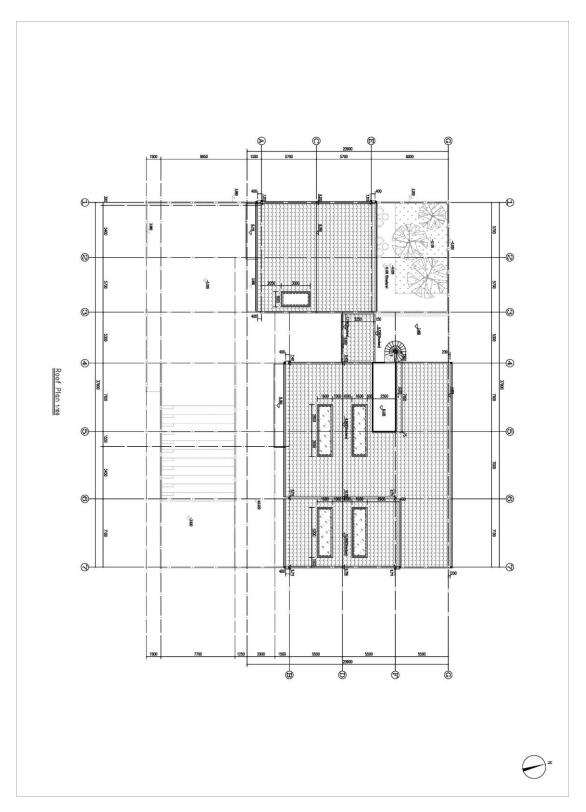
Roof Plan of Tourist Reception Center (Drawn by the author)
